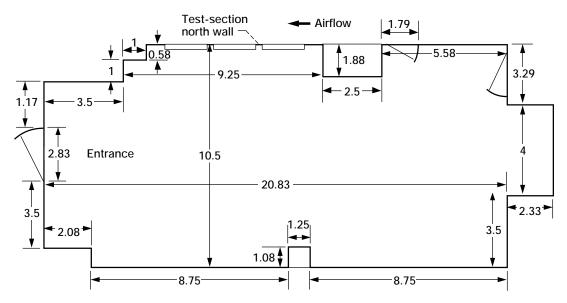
Floor plan of IRT secondary (tunnel-user) control room (all dimensions are given in feet).
